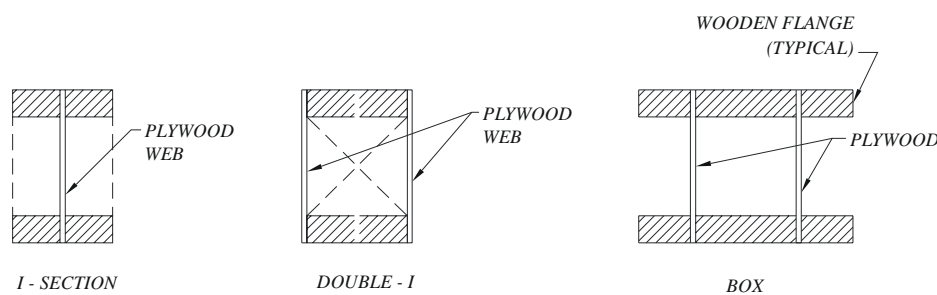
Typical Cross - Section Of Web Beams
